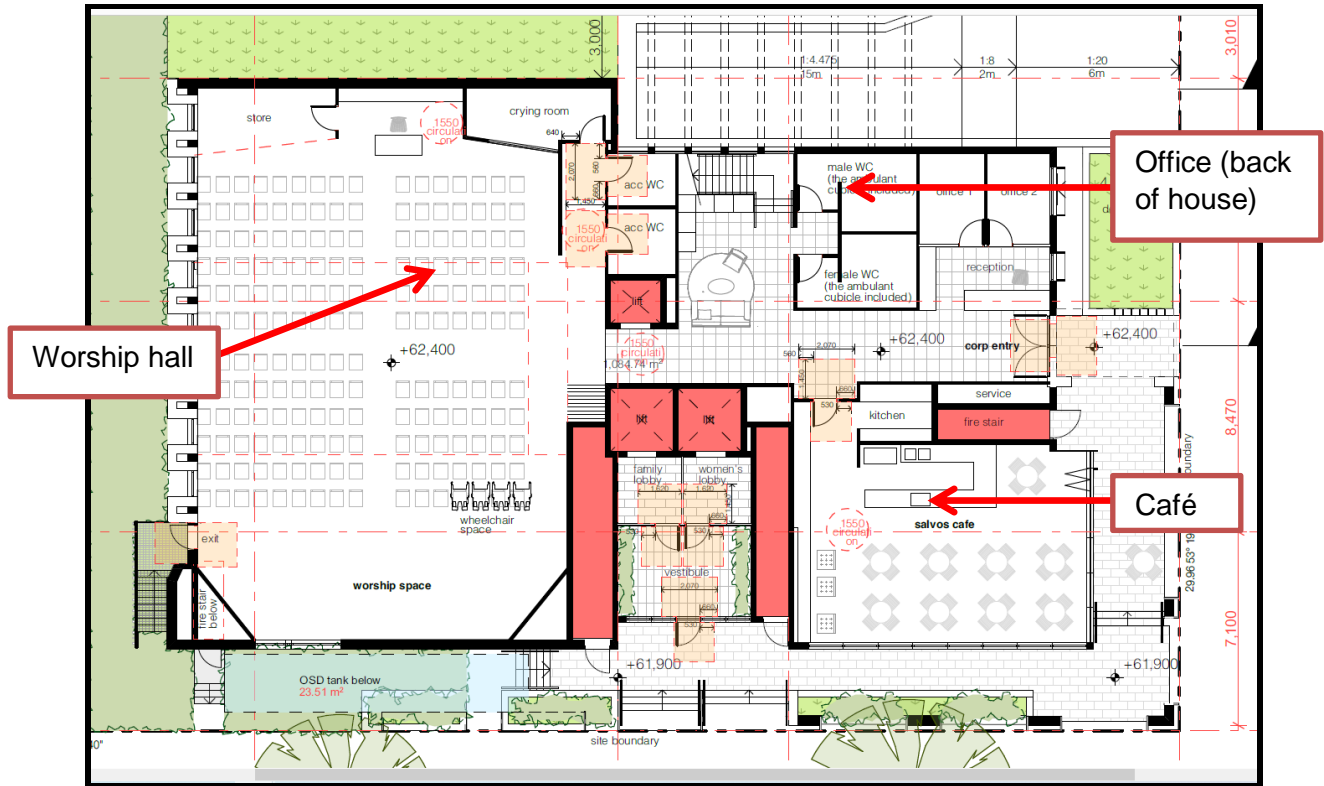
Proposed Ground Floor Plan (Source: Integrated Design Group, September 2020)
